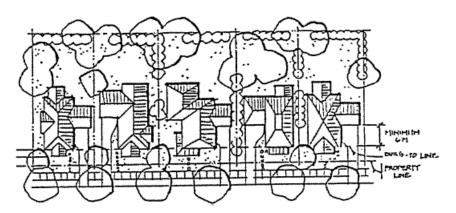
Side yard garages. Note 6m setback from main building facades. The layout of lots is mirrored to allow more space for on-street parking and trees.
